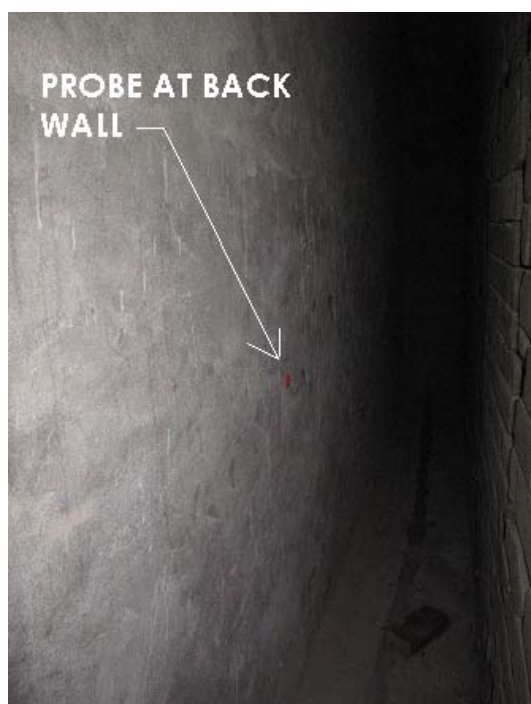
, Test Probe 3 – Installed at the back of block wall located at Battery Room 1
